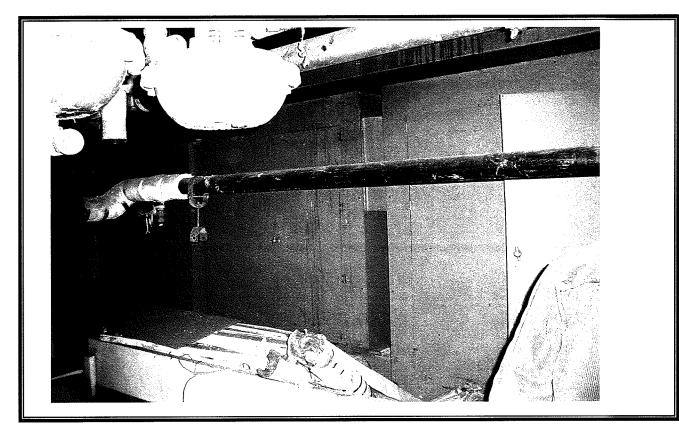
Conduit ductbank B. Forman BuildingPhoto Date12/05/06
